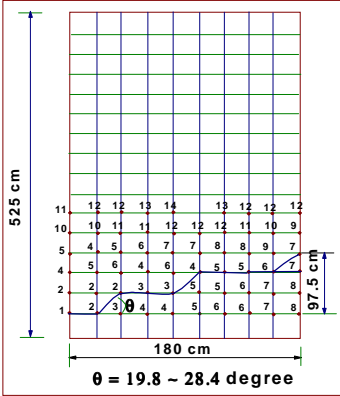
Crack propagation for RC pier with shear reinforcement = 0.35%.
